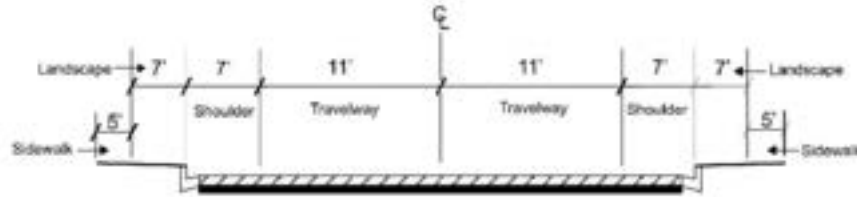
CITY OF CORONA GENERAL PLAN ROADWAY CROSS-SECTIONS (PAGE 2 OF 2)
